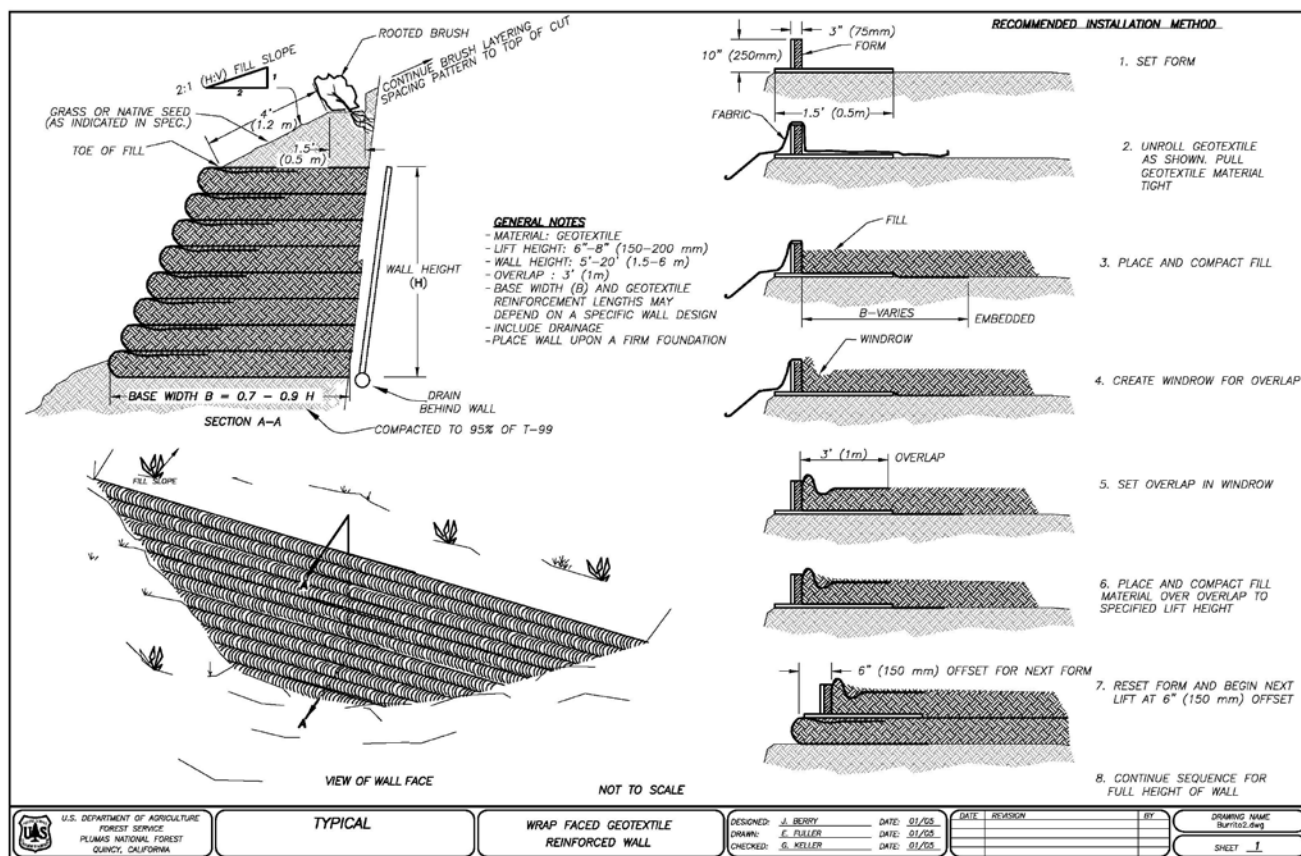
Typical drawing for a simple geotextile faced retaining wall.
